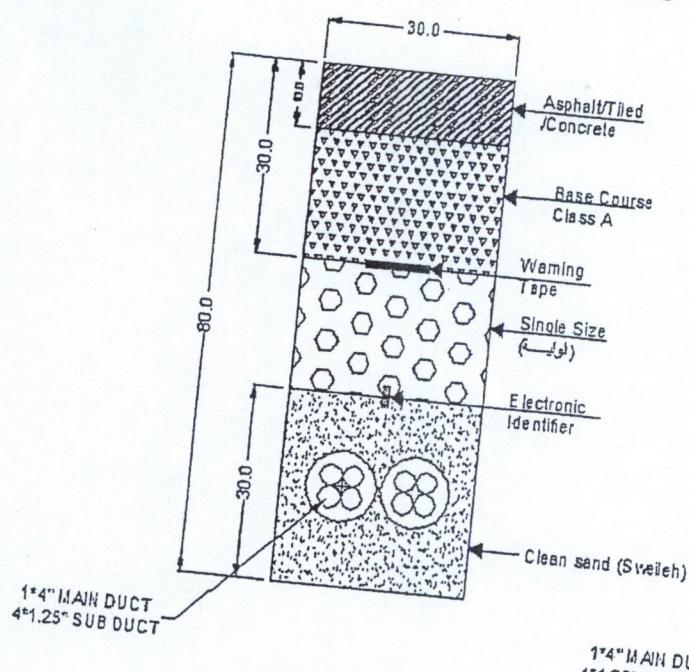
Installation of Ducts in Manholes B, C, D, E, F, and G
